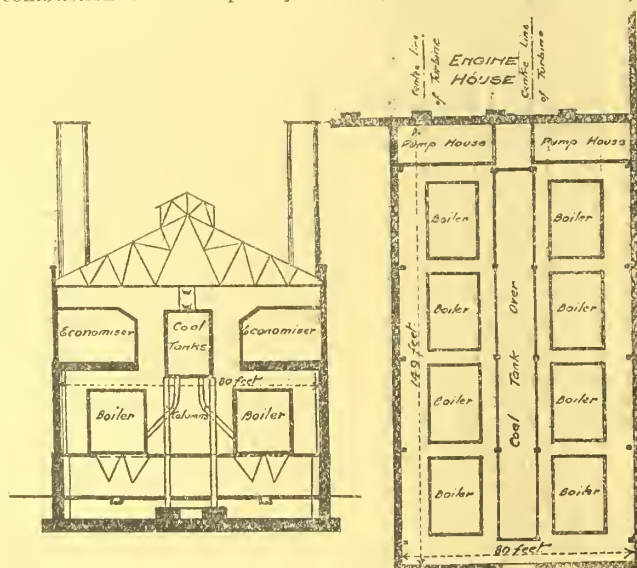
SECTIONAL ELEVATION AND PLAN OF BOILER-HOUSE.
